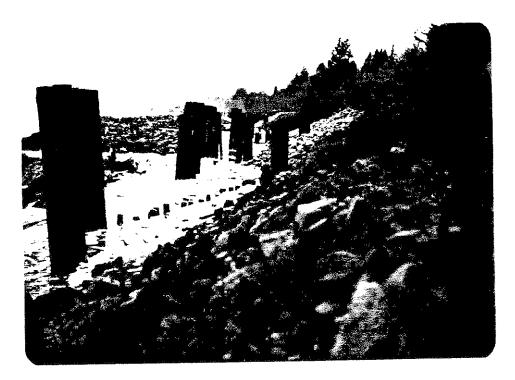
Another view upstream, a short distance upstream of photo 12. Riprap in this area has been placed for some time. Note old piles cut off above low water line at left. Also, looking upstream note intermittent placement of riprap.
